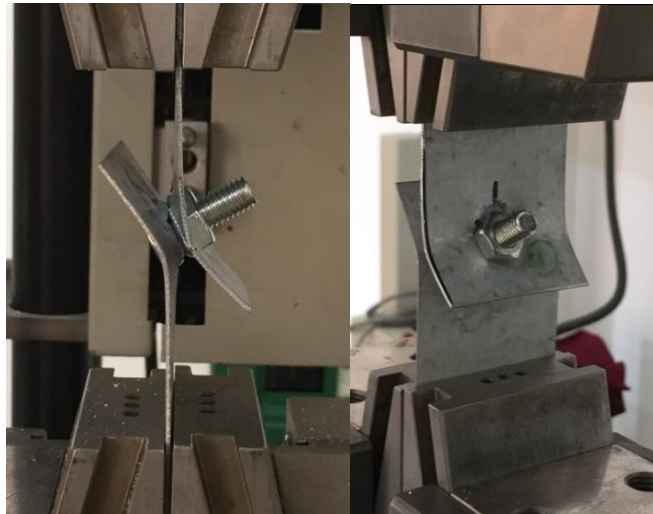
Bolt single lap-joint test failure mode (B2)
